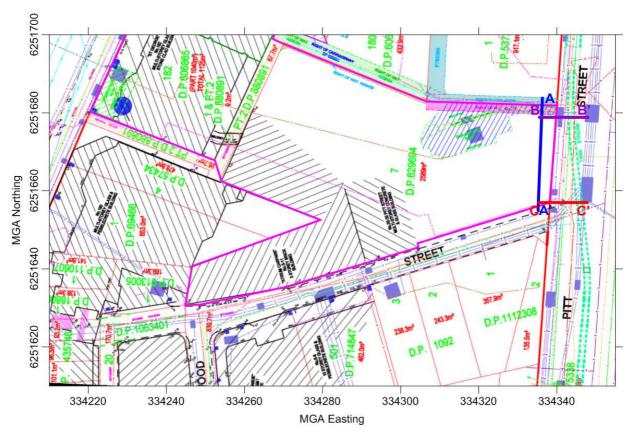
Plan of Site Showing Cross Sections A-A', B-B' and C-C'
